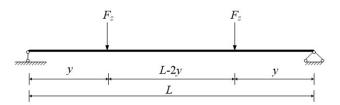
Load model 1 of trapezoidal corrugated web steel girder
